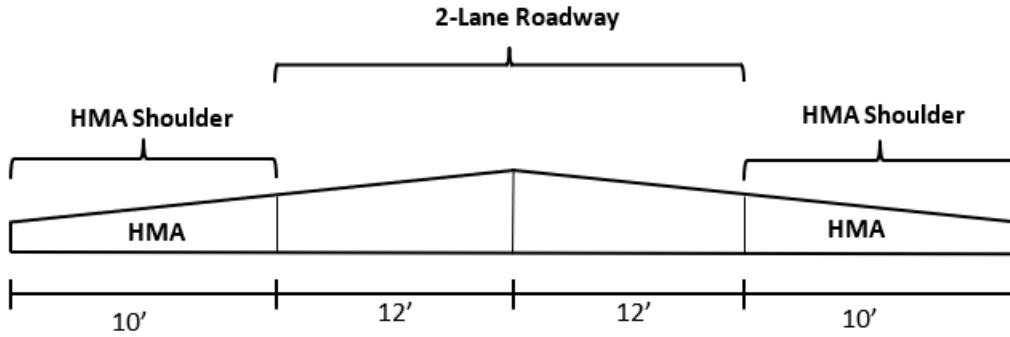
Cross Section of Pavement in Douglas County, Segments One and Three
